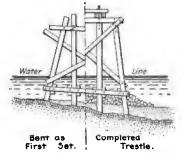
Setting Framed Bent for Trestle at Washout.
